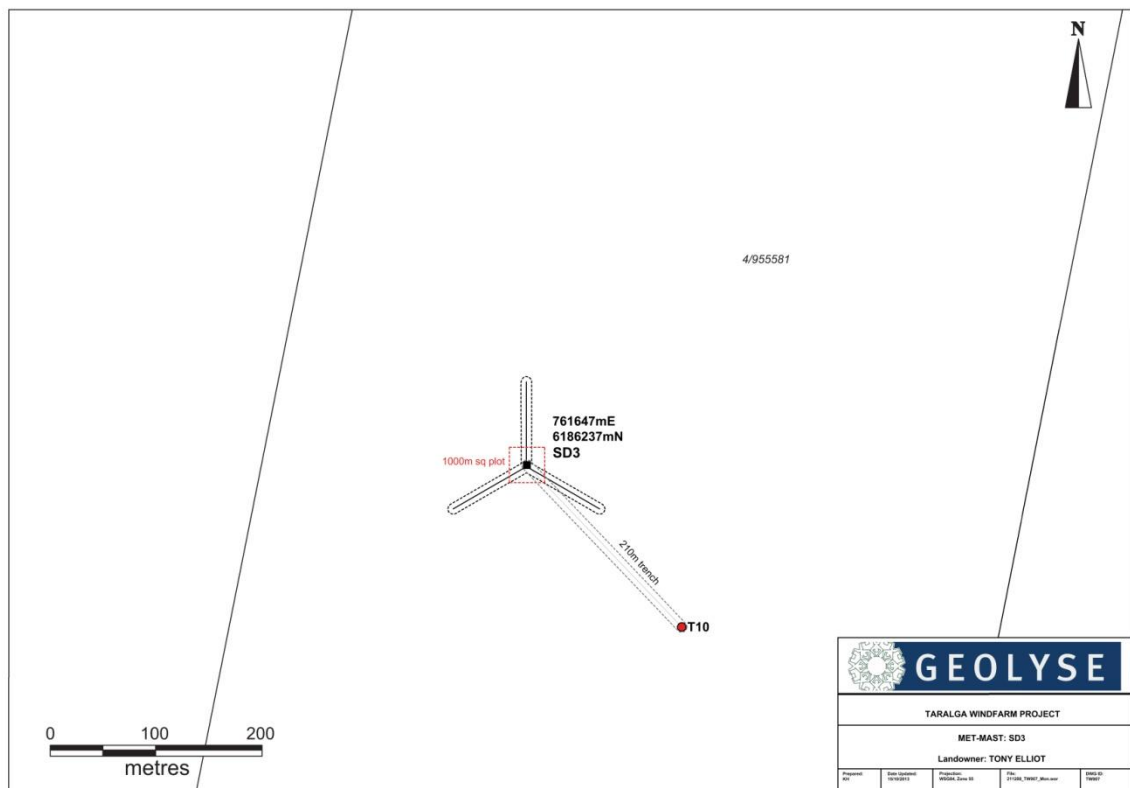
Plan of the proposed works at met-mast #SD3 and proposed trench to Turbine 10.
